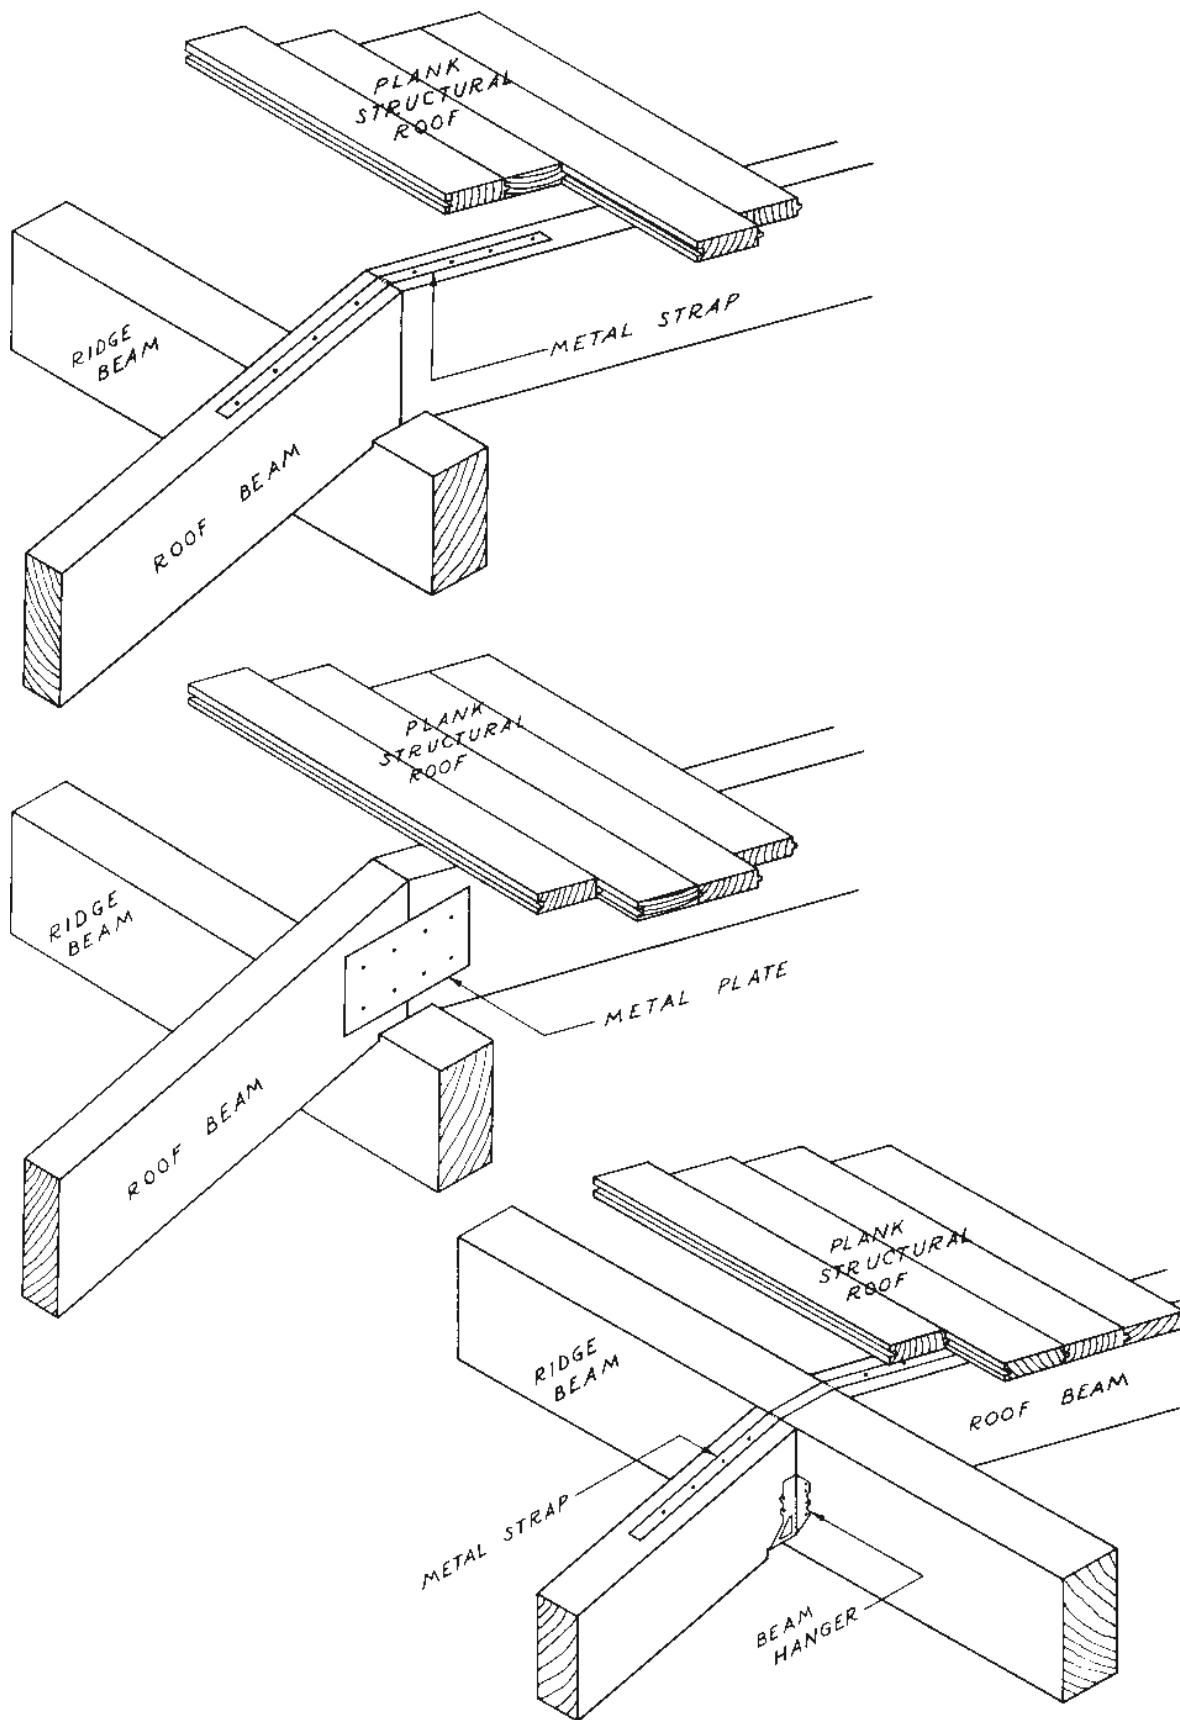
Arrangement of Roof and Floor Beams to Absorb Horizontal Thrust
